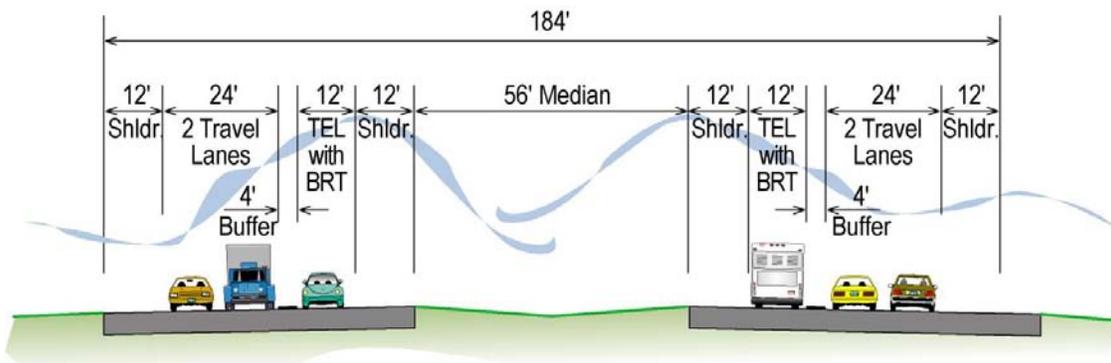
Package B Typical I-25 Cross Section - Harmony Rd. to SH 60
